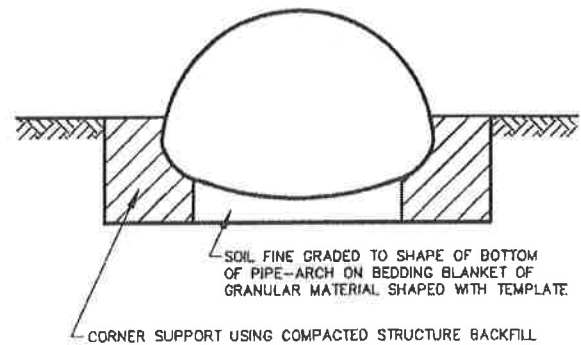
Foundation Treatment for Support of Corner or Side Plate Pressures
